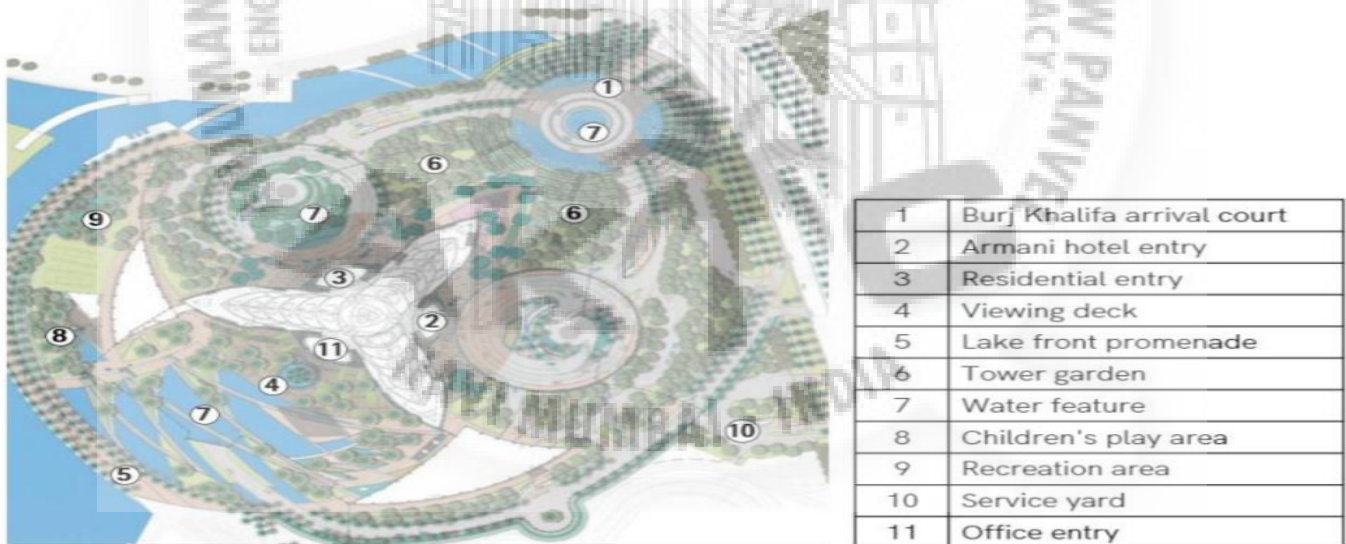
Site Plan Burj Khalifa (Source – archichoong)
